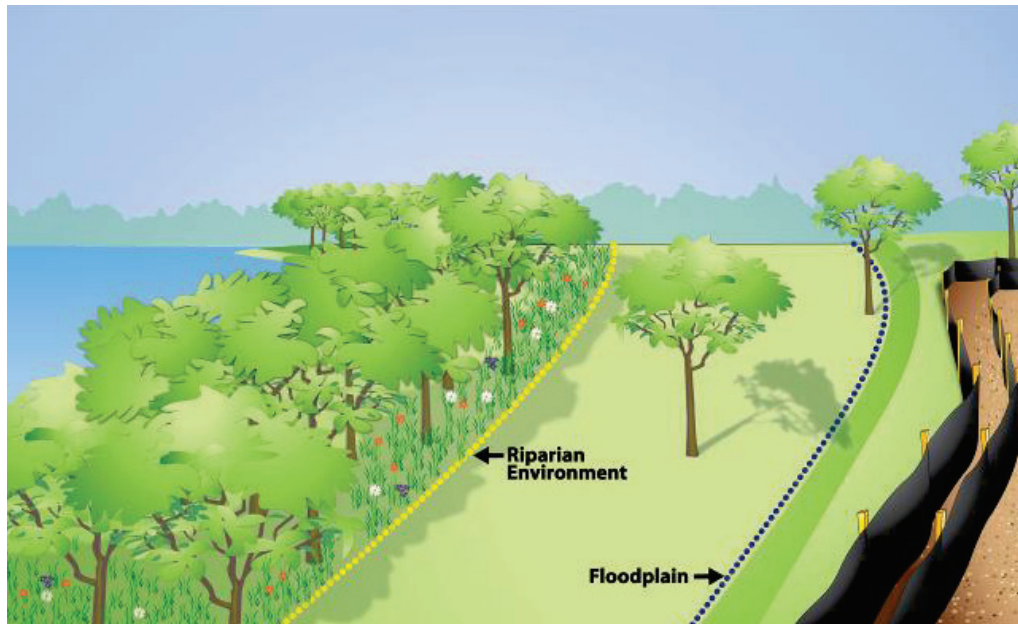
Example of a Double Row Silt Fence Protecting a Flood Protection Area
